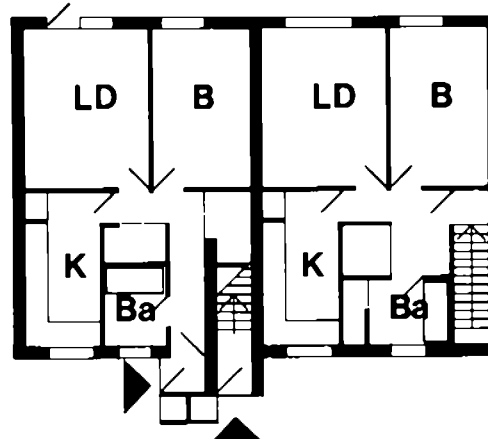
Typical popular plan forms used for recent housing projects in the public sector.
